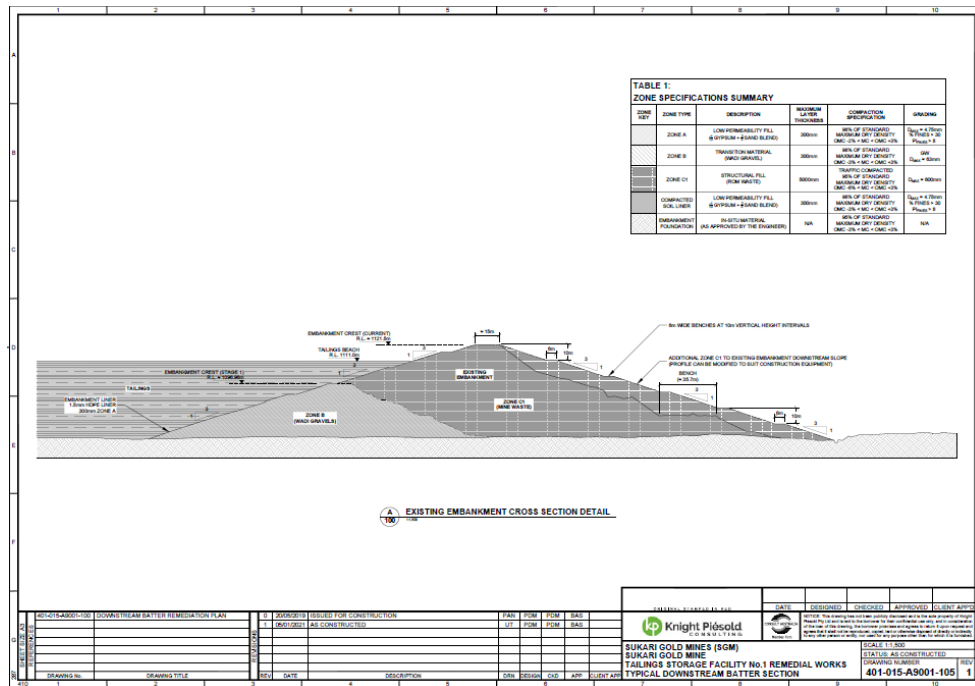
TSF No. 1 Typical Cross Section Showing Embankment Construction
